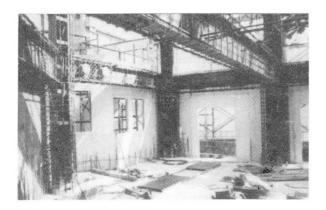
External wall formwork of Ichikawa Heights bldg. (Chiba pref.)
